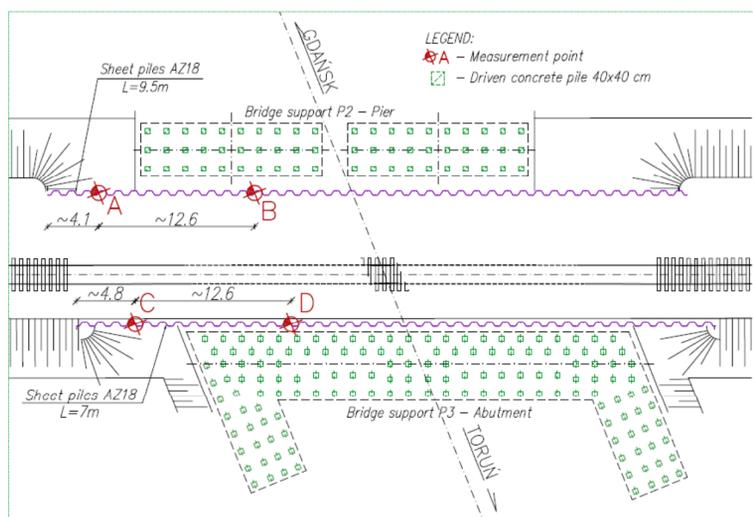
Layout of the retained rail-trunk-line and the designed viaduct foundations
